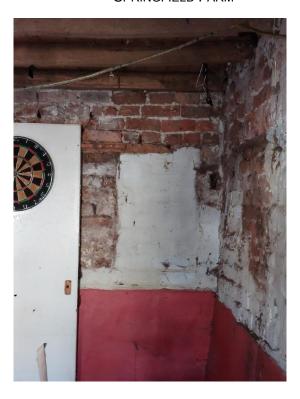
Detail Shot of Bricked up Window on North West Facing Elevation of Room G5
